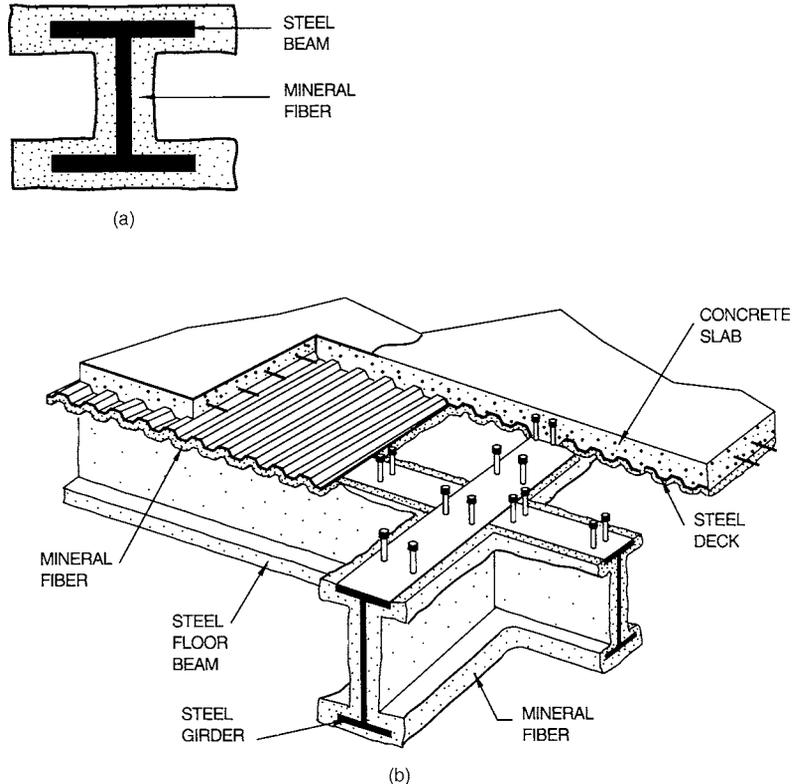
Mineral fiber spray applied to (a) steel beam; (b) beam-and-girder floor system, with steel floor deck supporting a concrete slab.
